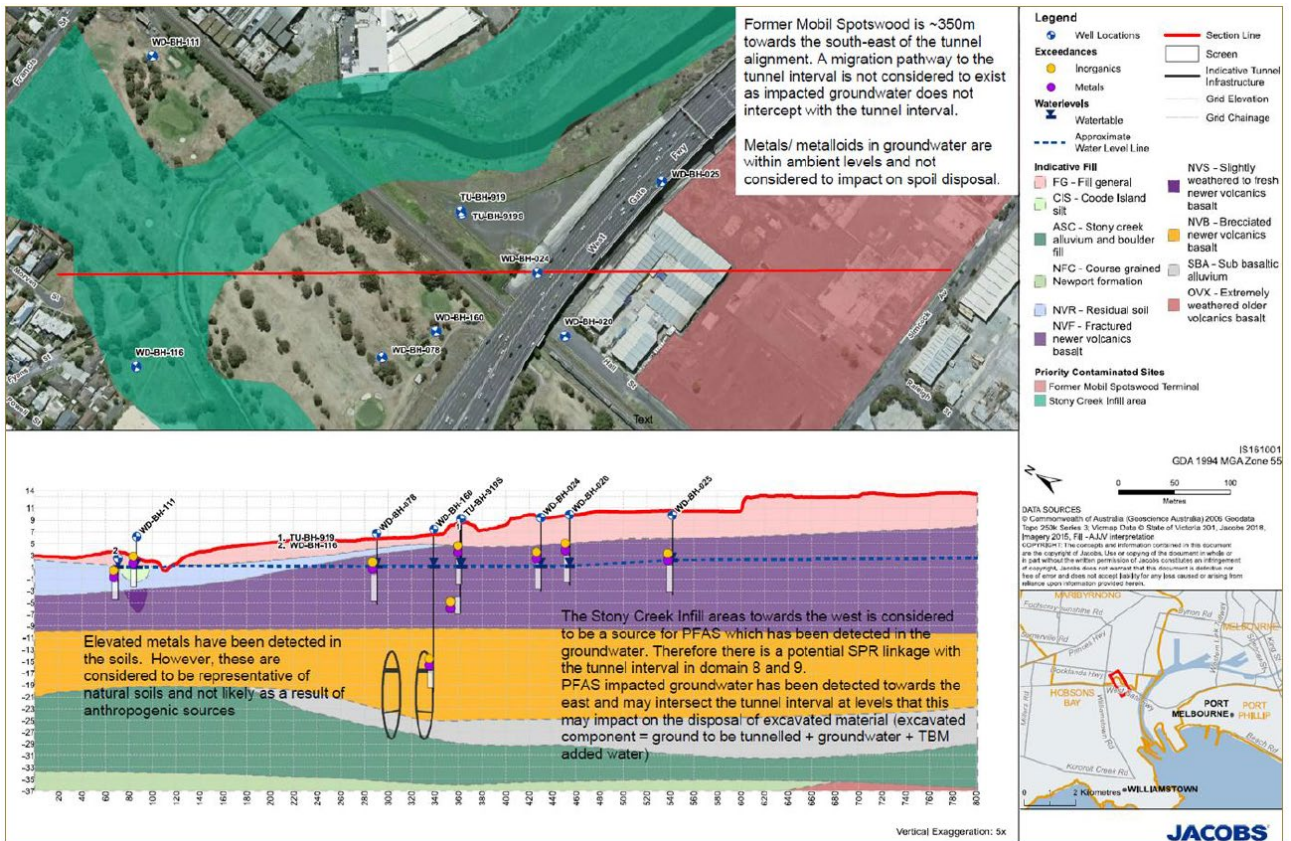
Conceptual site model cross section 3 – tunnels and Stony Creek
